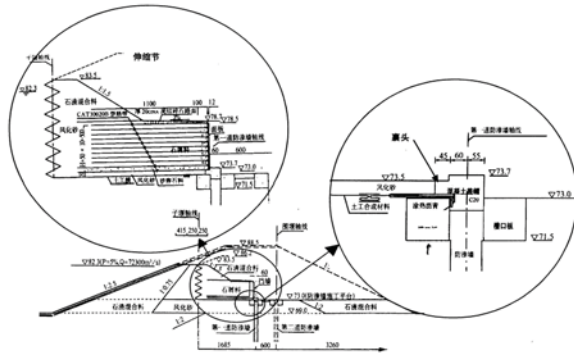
Connecting form of geomembrane, sub cofferdam and cutoff wall.
